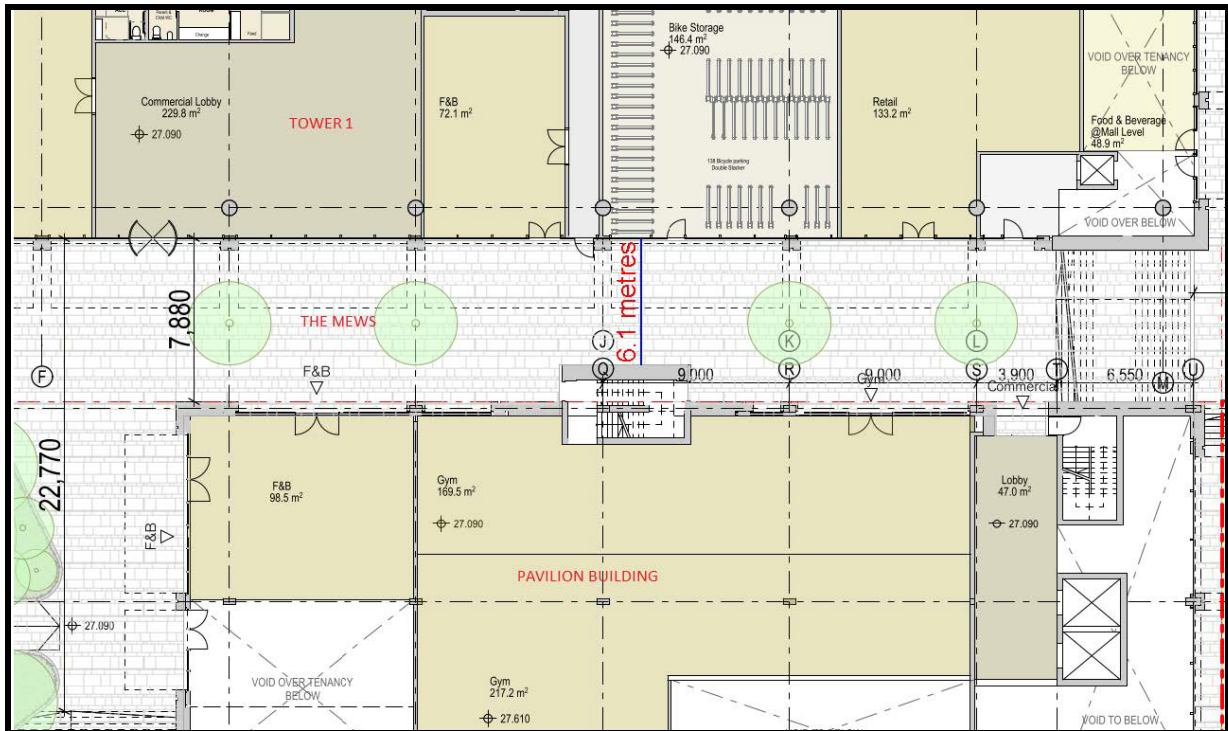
Ground Floor showing 7.88m width of The Mews with 6.1m pinch point at fire stair location
